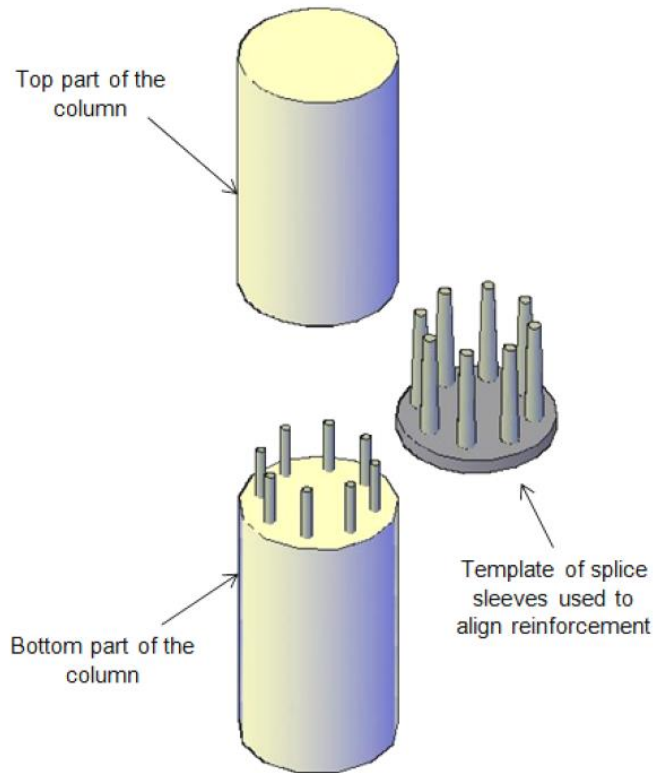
Template used for a column splice with grouted splice coupler (Aktan and Attanayake 2013)
